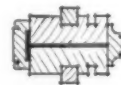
DETAIL "A" AN AUSTRAL WINDOW WITH PLASTER JAMBS SUITABLE FOR SCHOOLS OFFICE BUILDINGS ETC.
